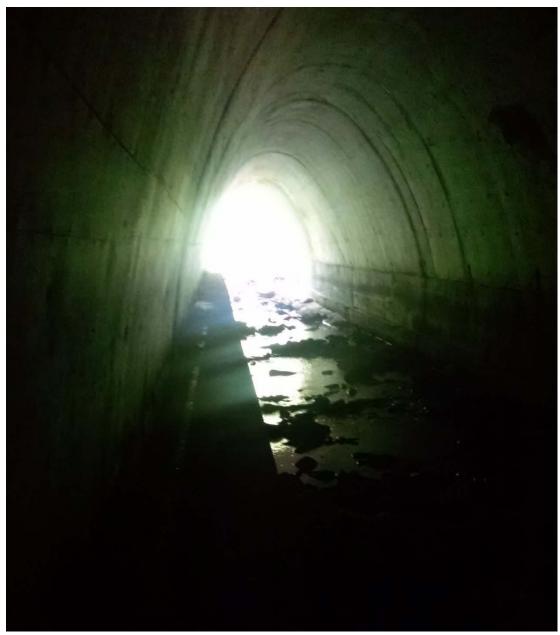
Inside Culvert under 81 near Laurel Run #2 Dam (Photo 62)
